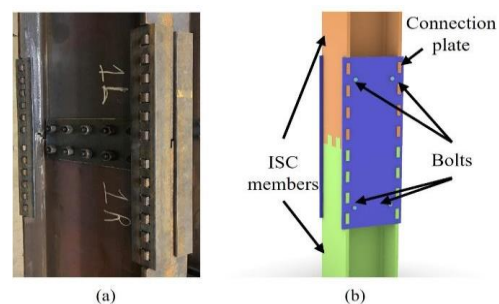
Proposed ISC; a) fabricated ISC with initial design [3] and b) CAD design of ISC with
